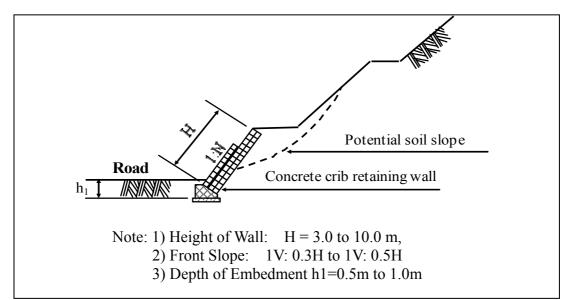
Detail of Concrete Crib Retaining Wall Source: Modification from Reference No. 5 DESIGN GUIDE – EARTHWORKS, Published by Japan Highway Public Corporation, May 1998.
